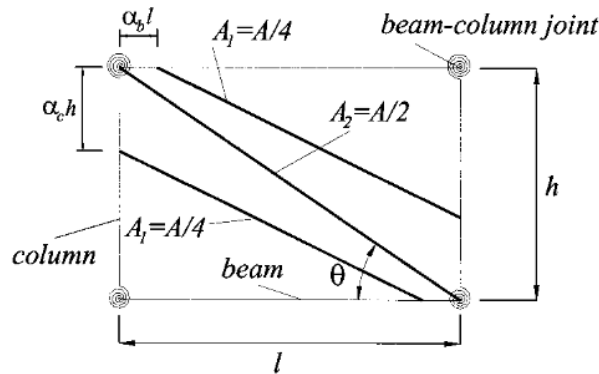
Proposed concrete masonry-infilled steel frame model (El-Dakhkhni et al., 2003) (only the struts active in one direction are represented)
